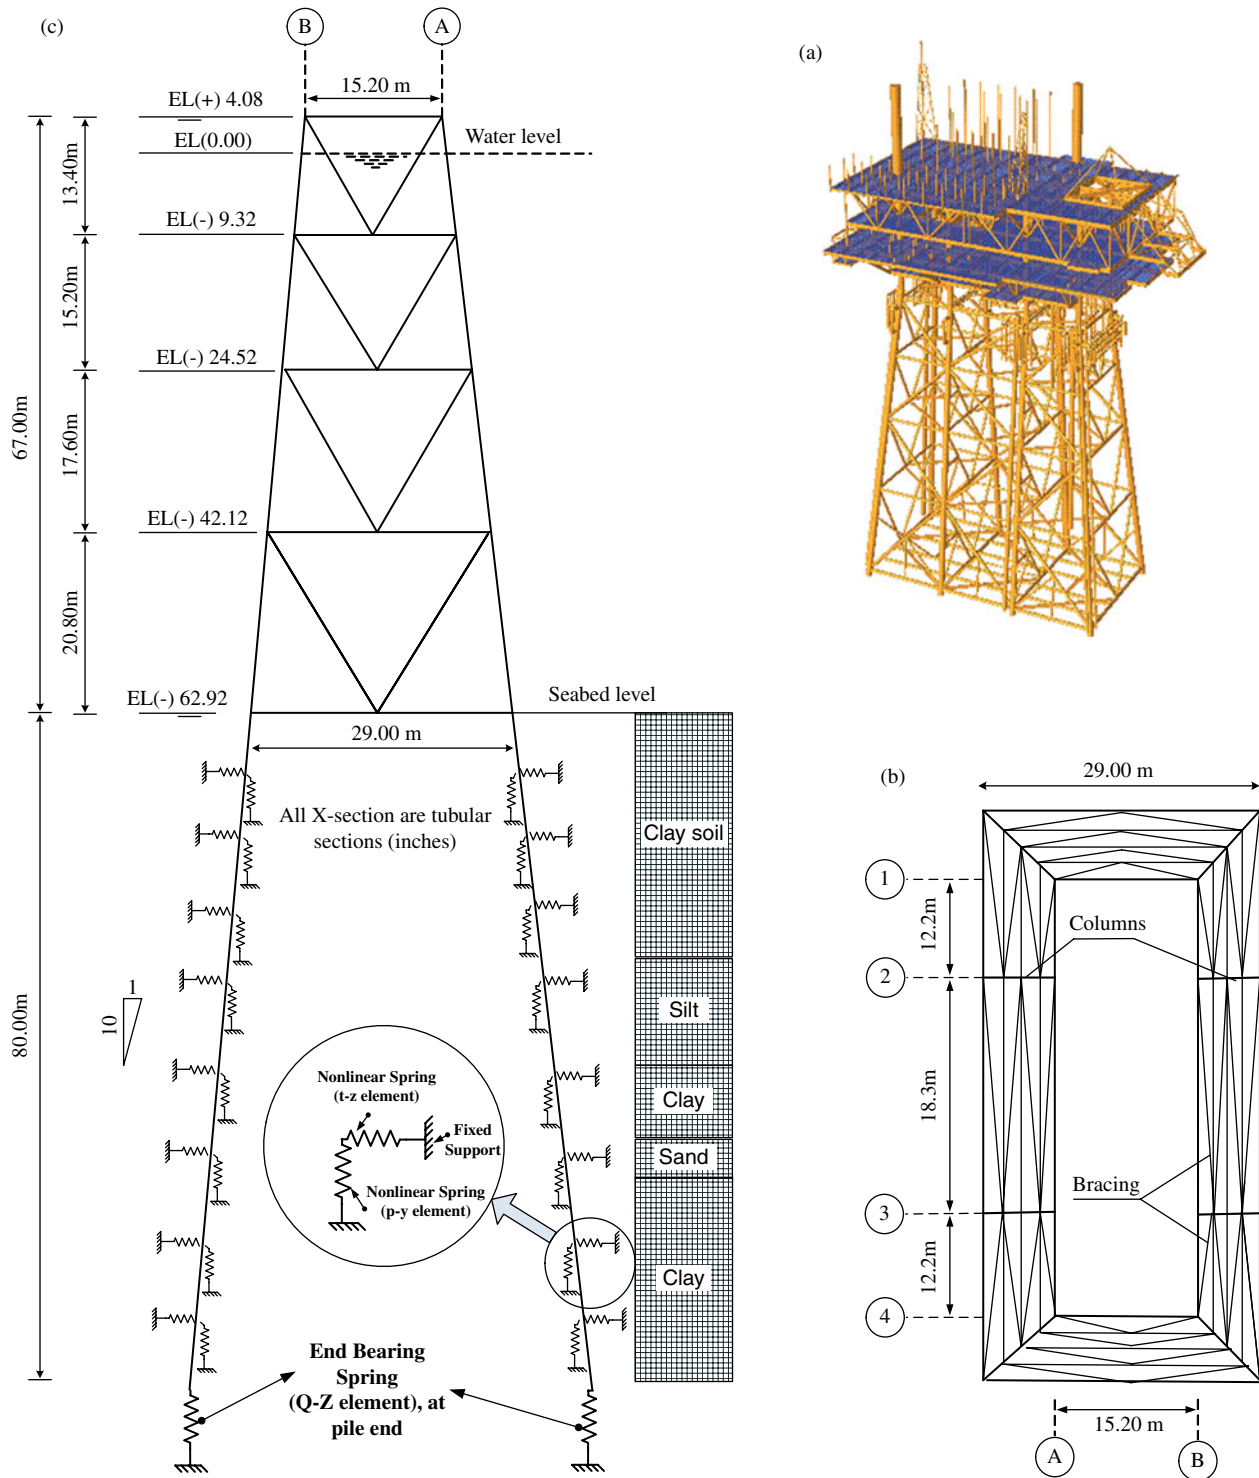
Jacket structure schematic views: (a) perspective plot of the actual platform; (b) plan view of the jacket; (c) 2D single frame extracted from the actual platform with the soil–pile configuration.
